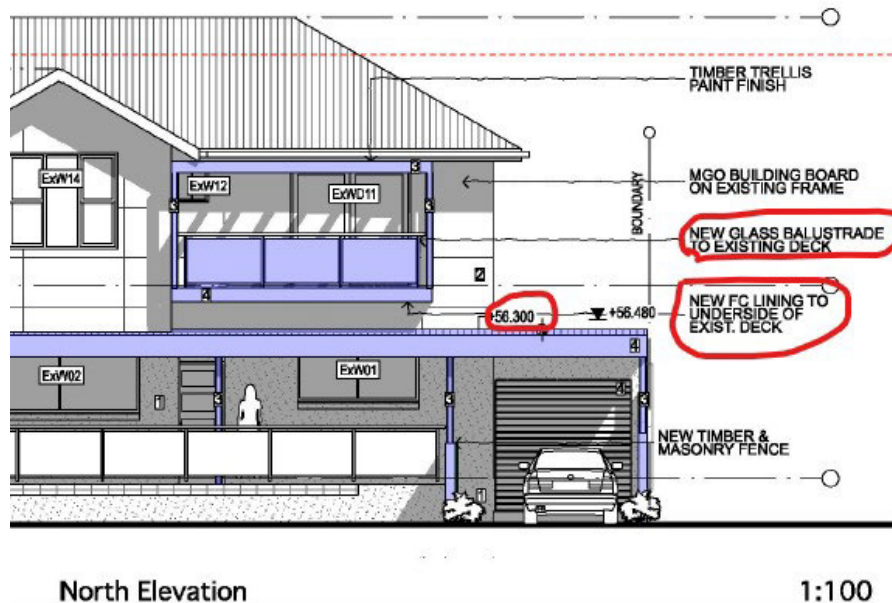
The Consent approved a new glass balustrade to the existing deck and a new FC lining on the underside of the existing deck. The Deck is shown at RL 56.300.
